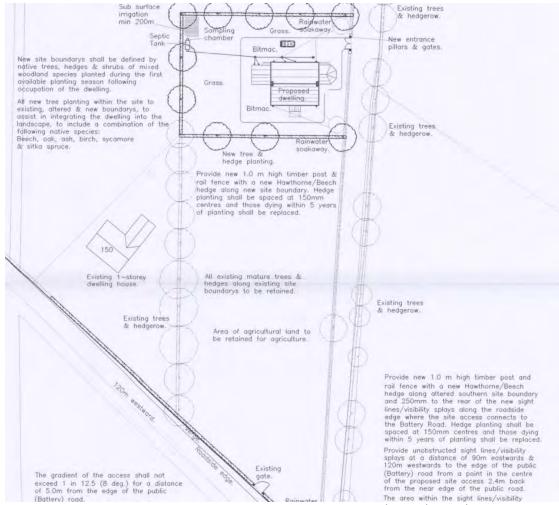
Block plan granted under planning application I/2002/0786/F show land to front of dwelling to be retained for agriculture.
